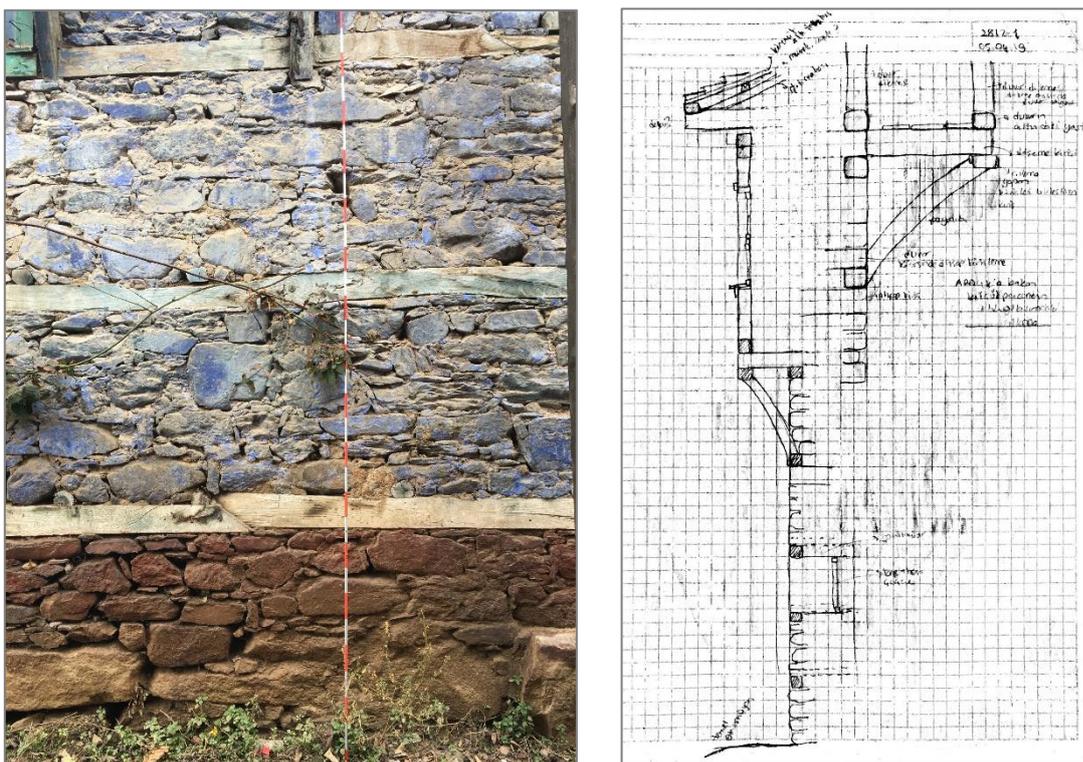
Second stage: measuring facade by surveying rods (left), sketch of the building: 2812-1 (right)
